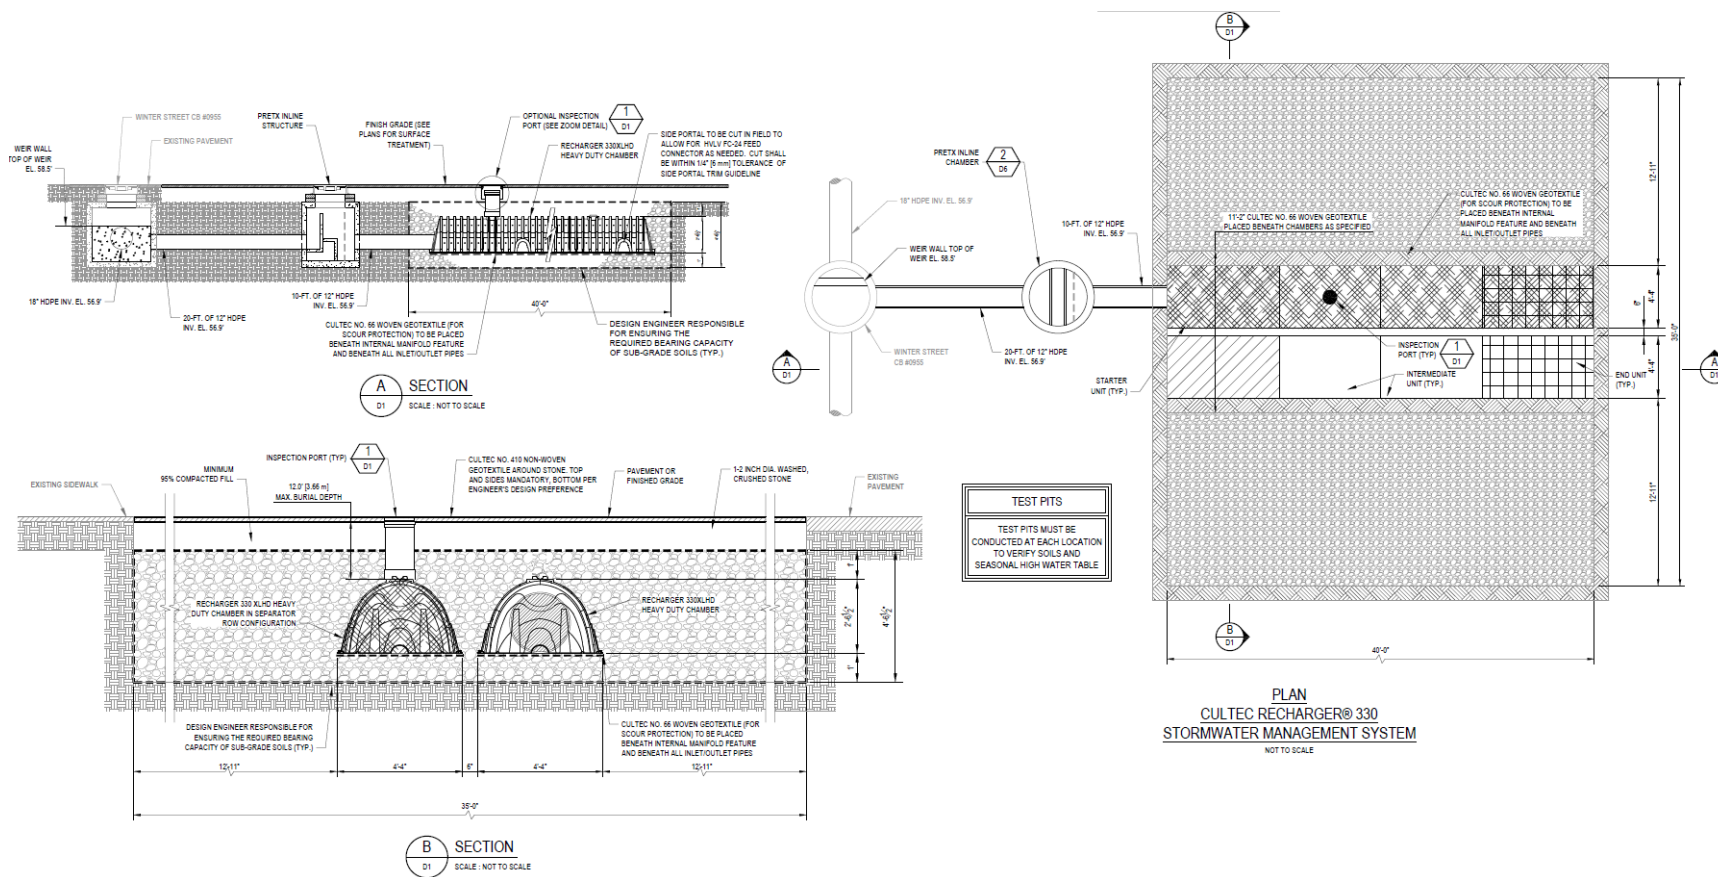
Engineering Detail for Winter Street Subsurface Infiltration BMP 1
